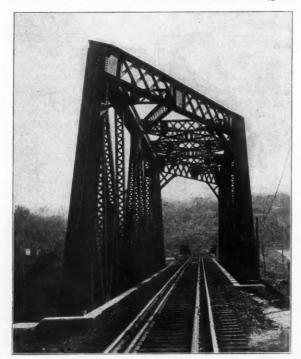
Truss-Bridge with Type C Floor, B. R. & P. Ry.
